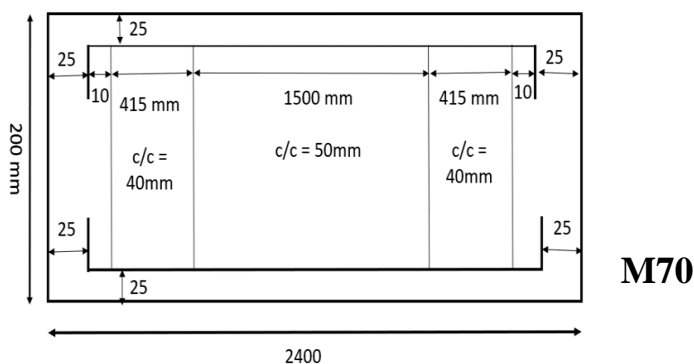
(c) Design details for M40 and M70 reinforced beam (Lateral View)
